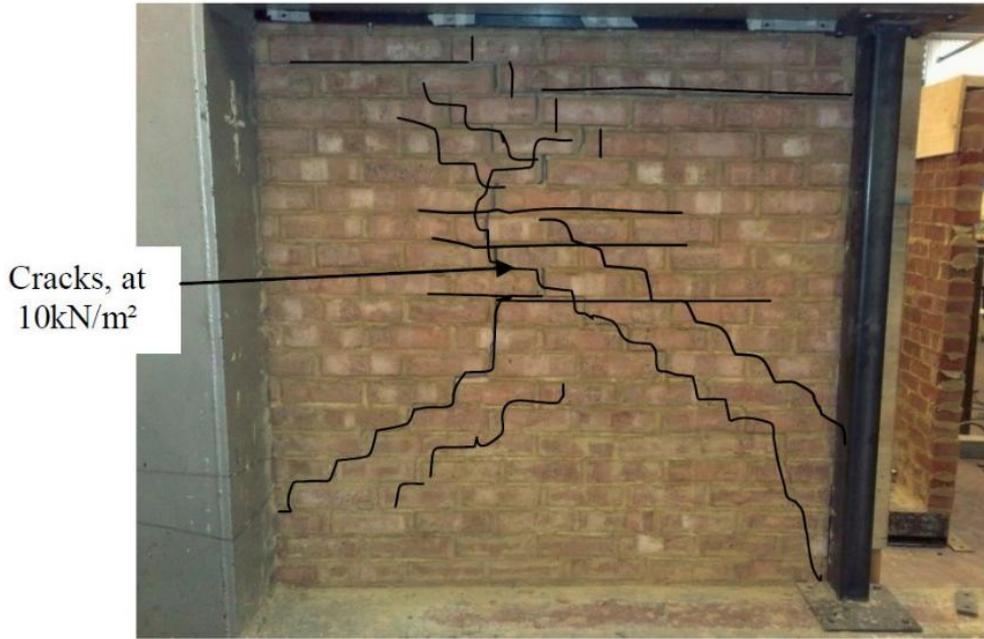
The cracks in the wall tested by Sayari after out-of-plane loading of the wall
